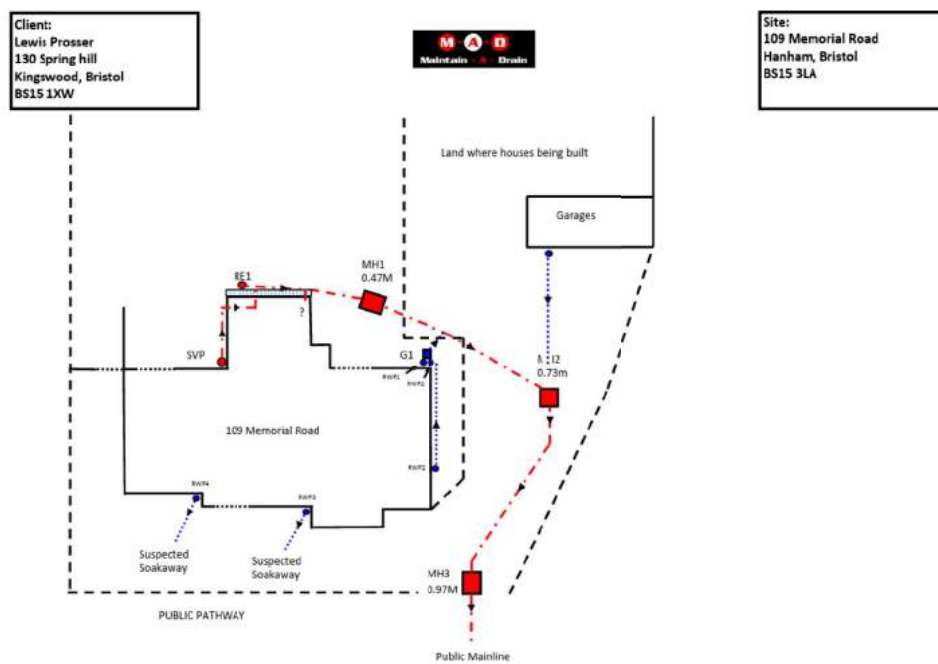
CCTV DRAINAGE SURVEY PLAN
